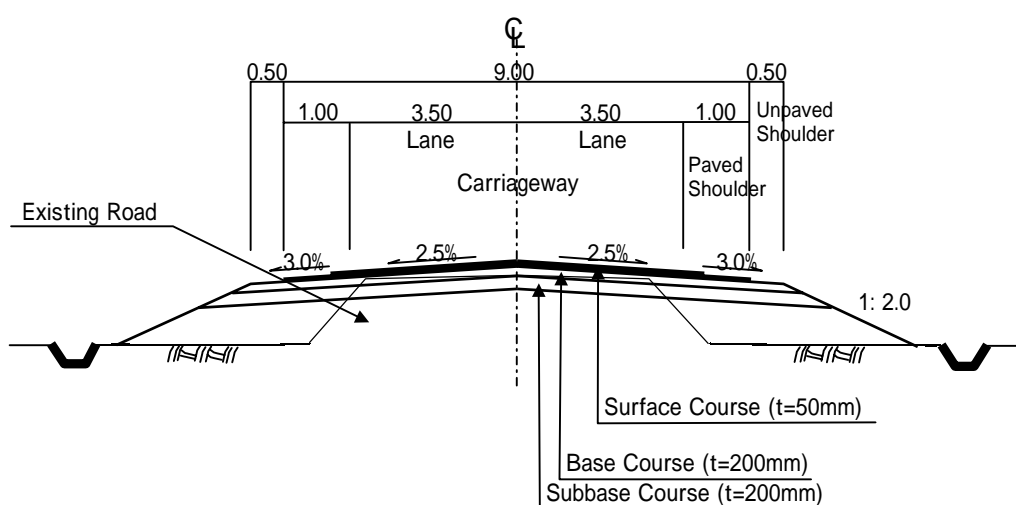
Typical Cross Section for Proposed Route (L = 6.50km)
